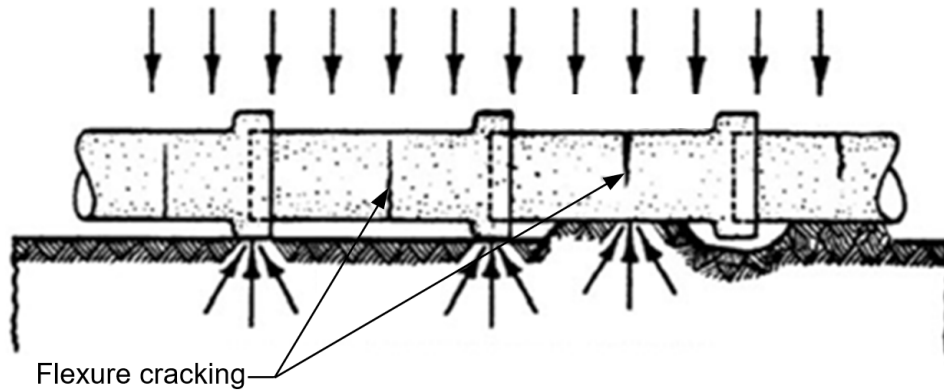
Transverse Cracks in Pipe Culvert
